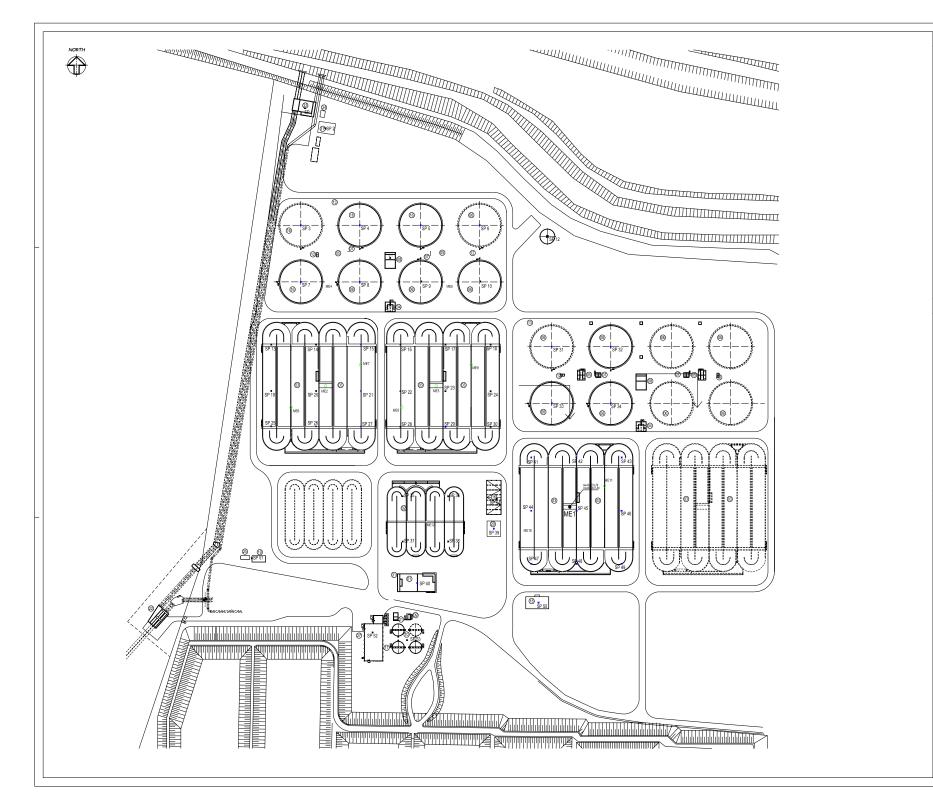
SP Layout of Bursa East Waste Water Treatment Plant Project
